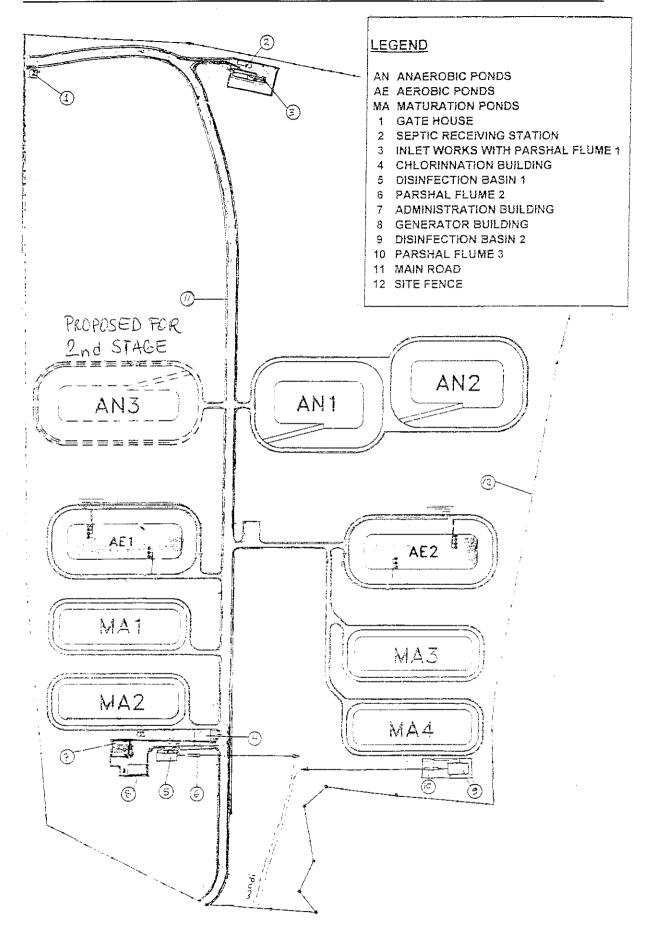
Schematic Layout of Existing Wastewater Treatment Plant - WADI ESSIR
